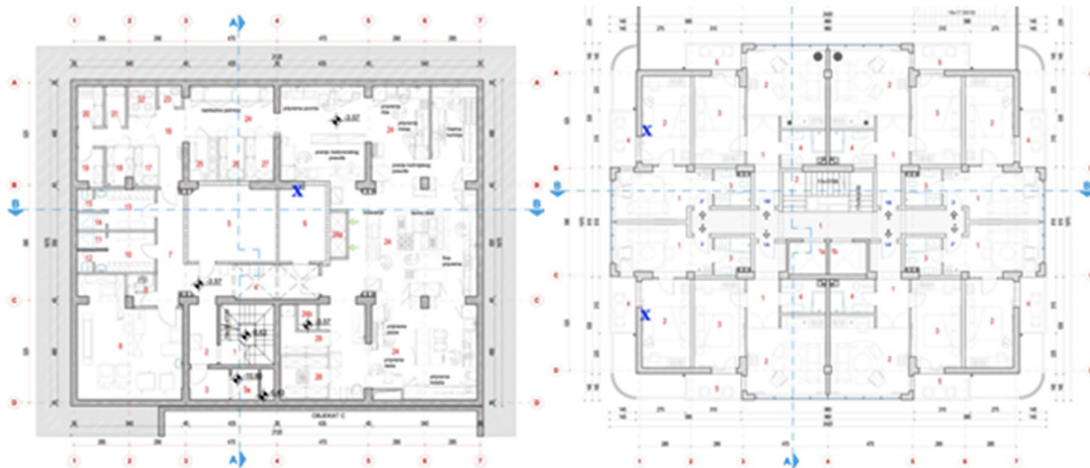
Location of the three QUAKE MEMS sensors installed in the building in Budva: basement (left) and 13th floor (right).
